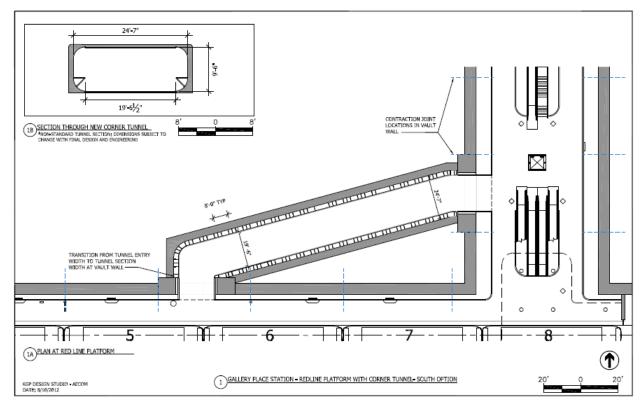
Diagonal Passageway Configuration and Contraction Joint Locations
